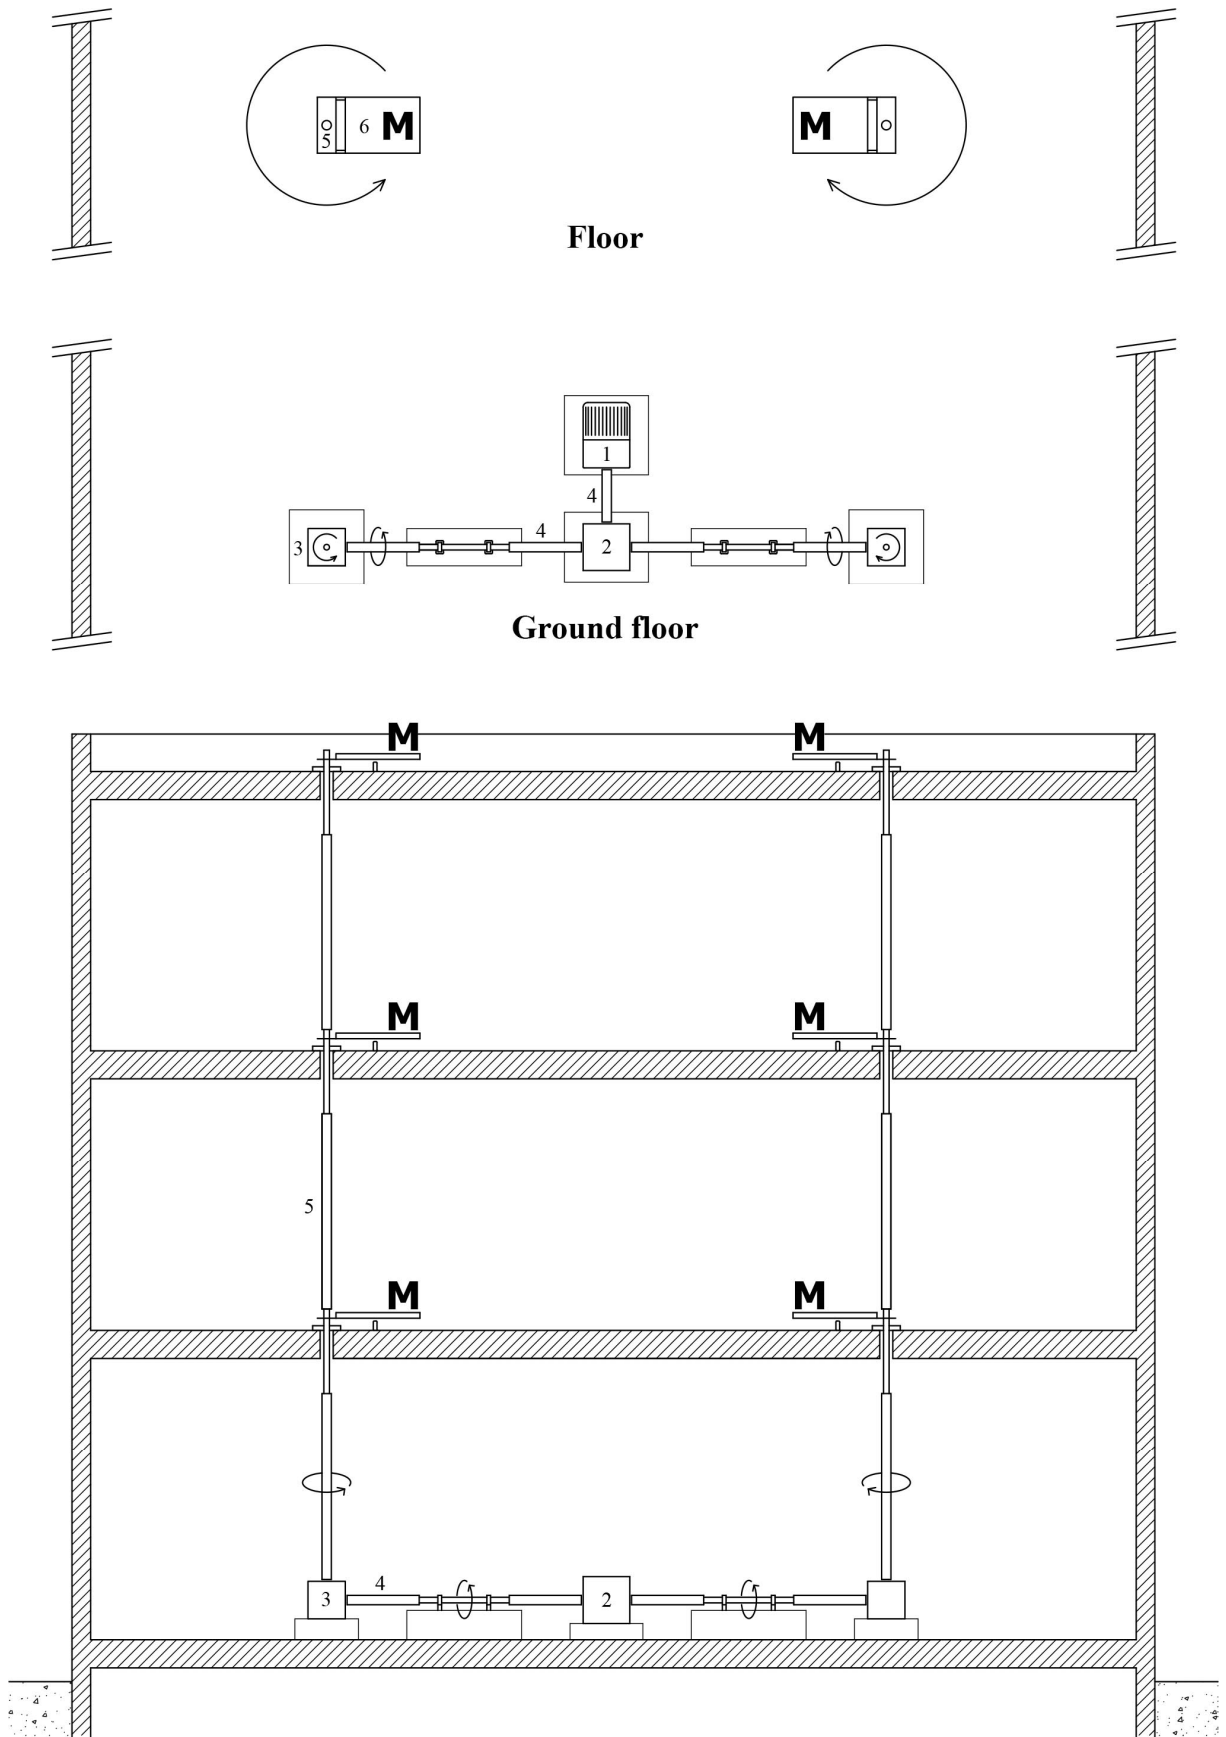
Mechanical device: asynchronous motor (1), angular gearboxes with reduction ratio (2 & 3), horizontal drive shaft (4), vertical drive shaft (5), eccentric mass structure (6)
